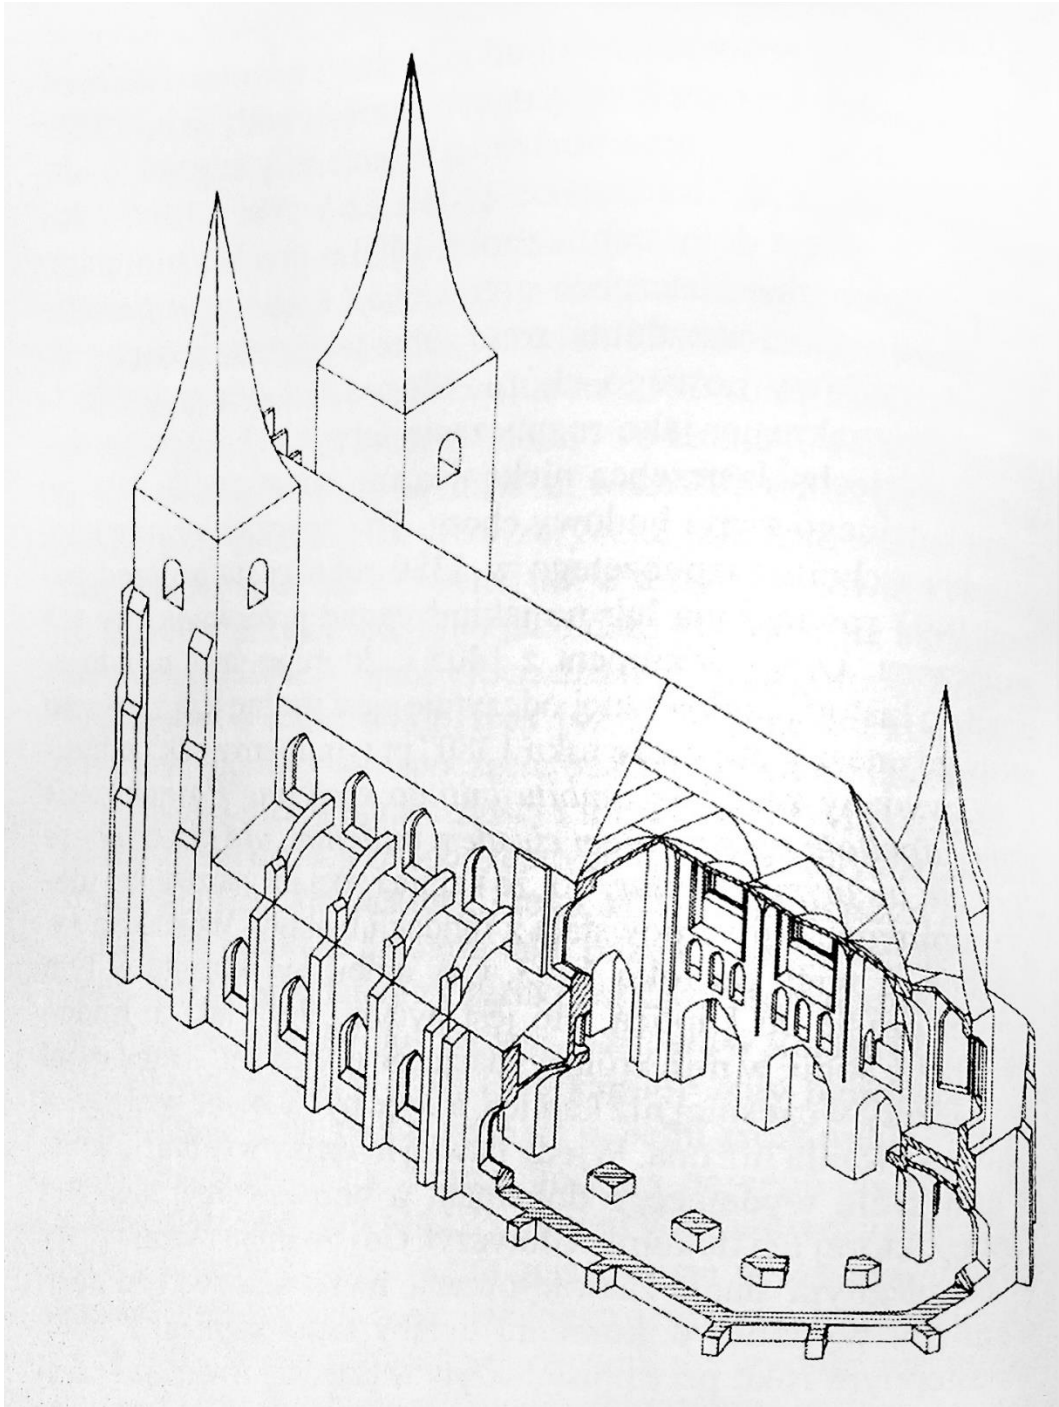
Poznan Cathedral, reconstruction showing ambulatory and three towers
